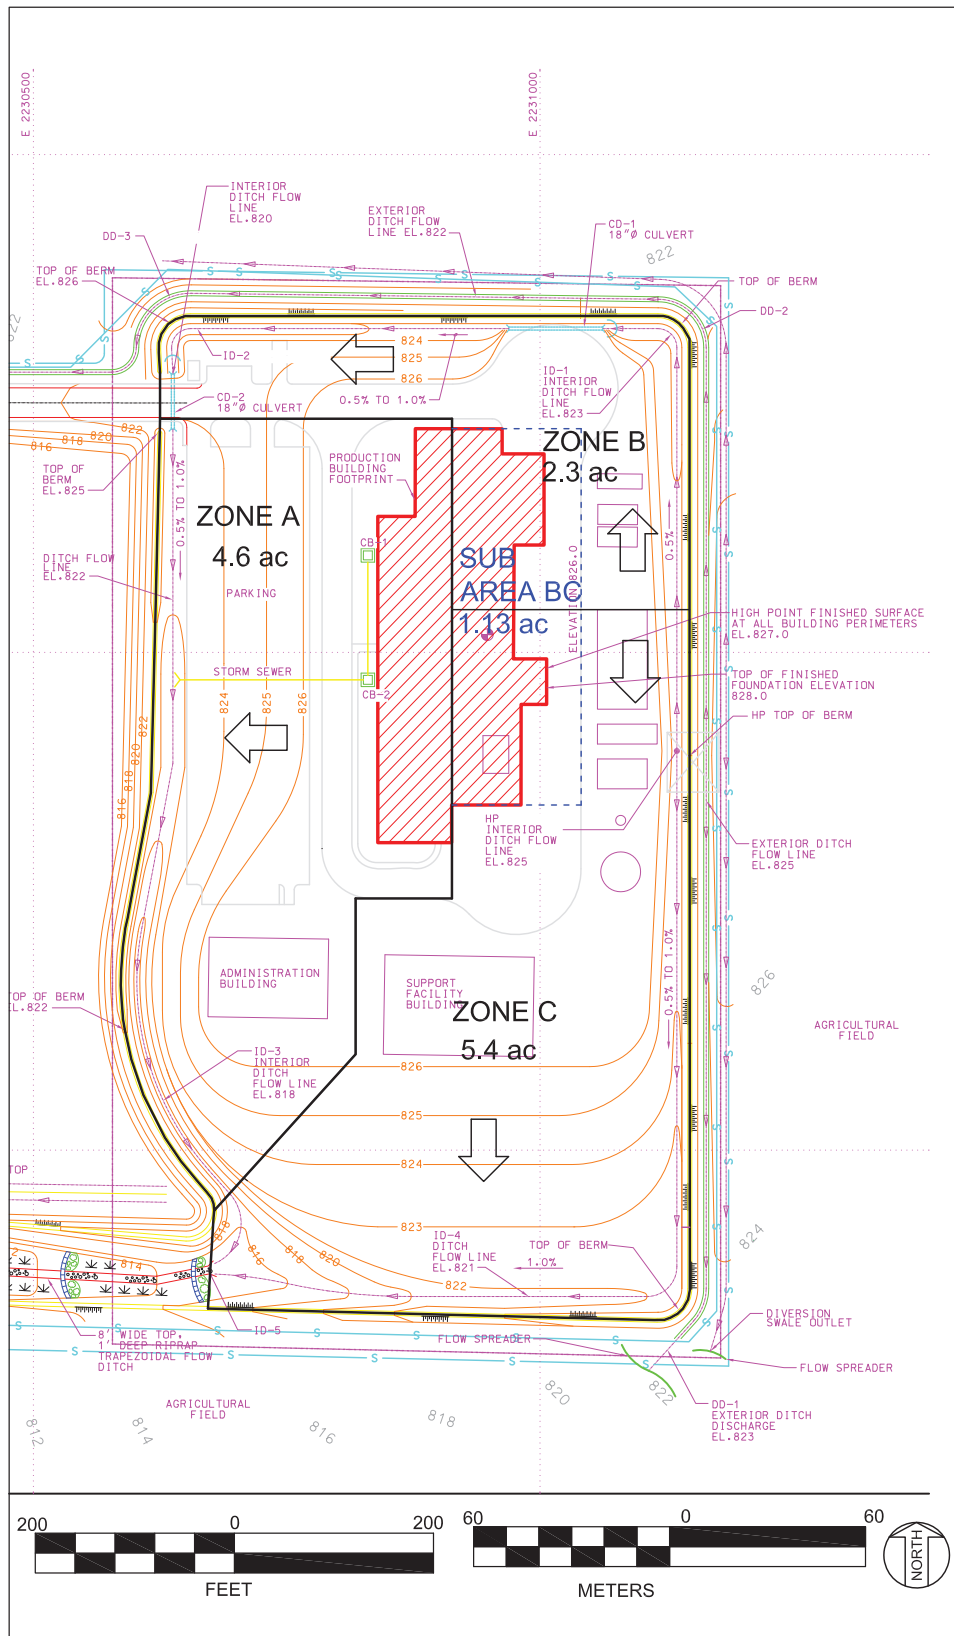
Plan – Off-Site Drainage Area Delineation
